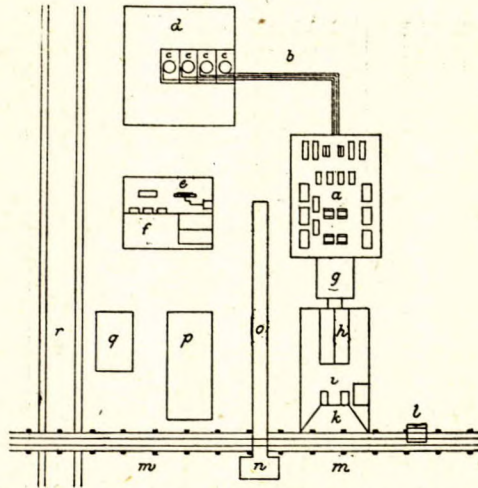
Sketch of milling plant of the American Asbestos Co., Black Lake.
